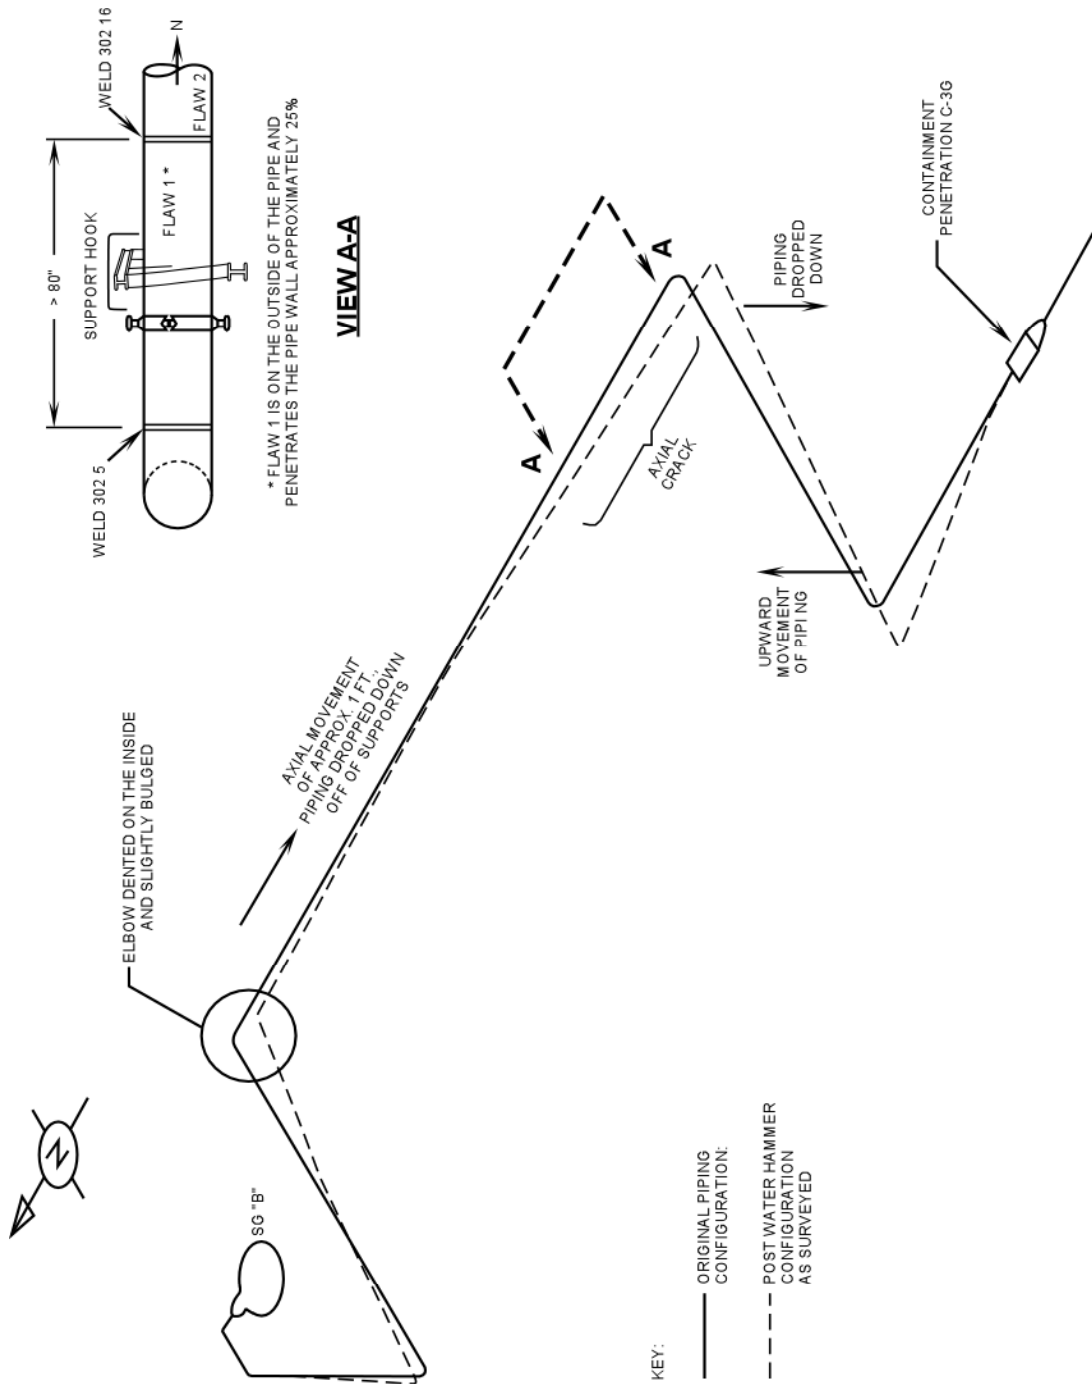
Overview of Feedwater Piping and Support Damage Due to Water Hammer
